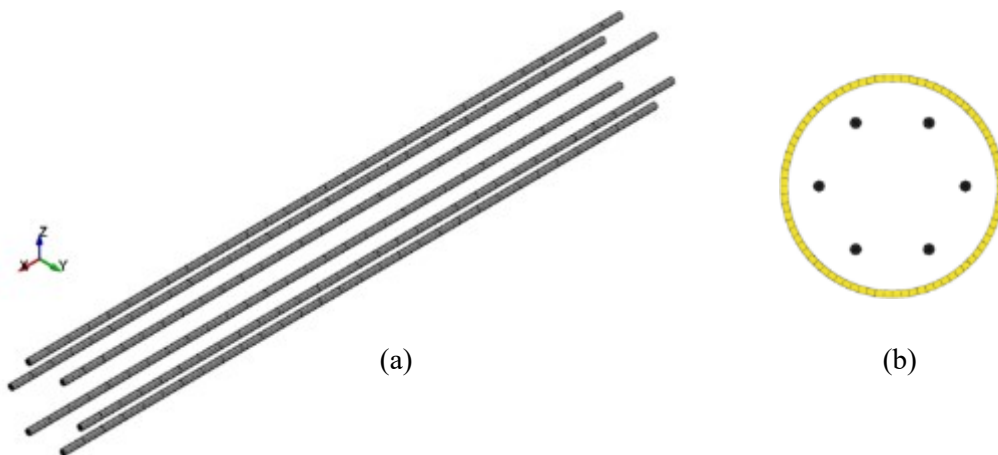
Steel rebar arrangement: (a) Isometric view; (b) Cross-sectional view
